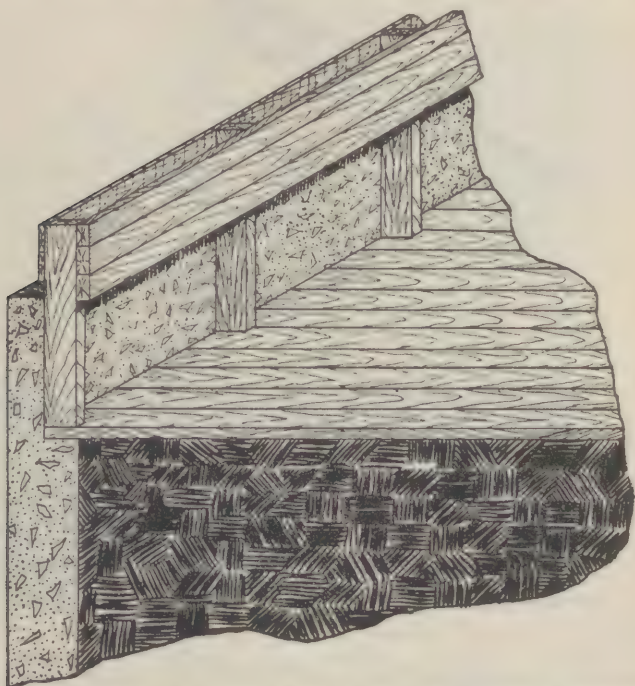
(Schematic). Method of rat proofing building by concrete area wall extending one foot above and two feet below the floor.
